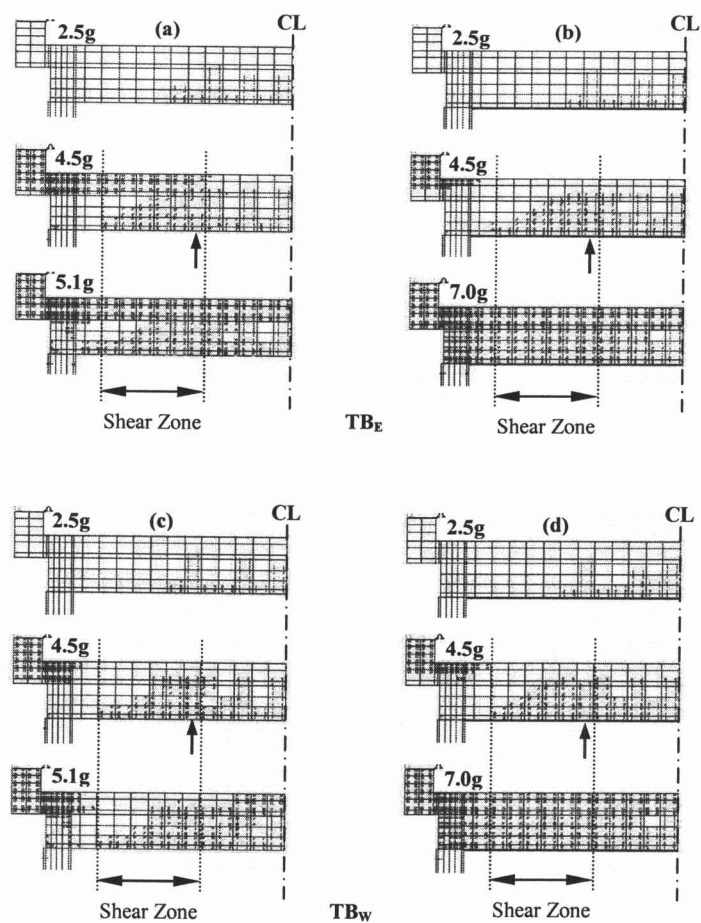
Crack Propagation in Transverse Beams (Scaled Gravity Loading): (a) and (c) Unstrengthened Bridge; (b) and (d) FRP-Strengthened Bridge
